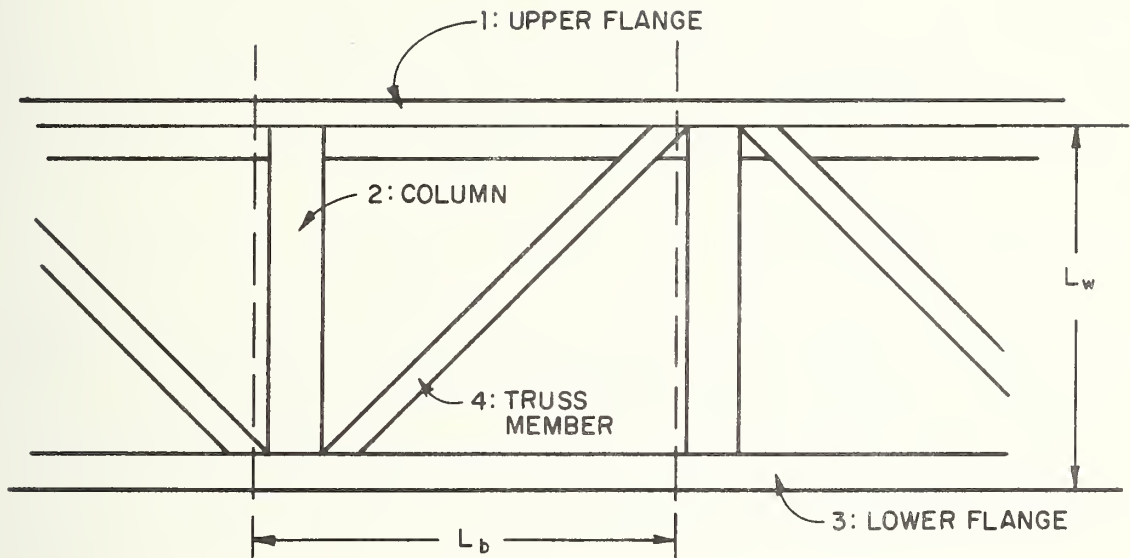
SKETCH OF A TYPICAL OPEN WEB STEEL GIRDER, SHOWING THE CONFIGURATION OF ONE BAY
